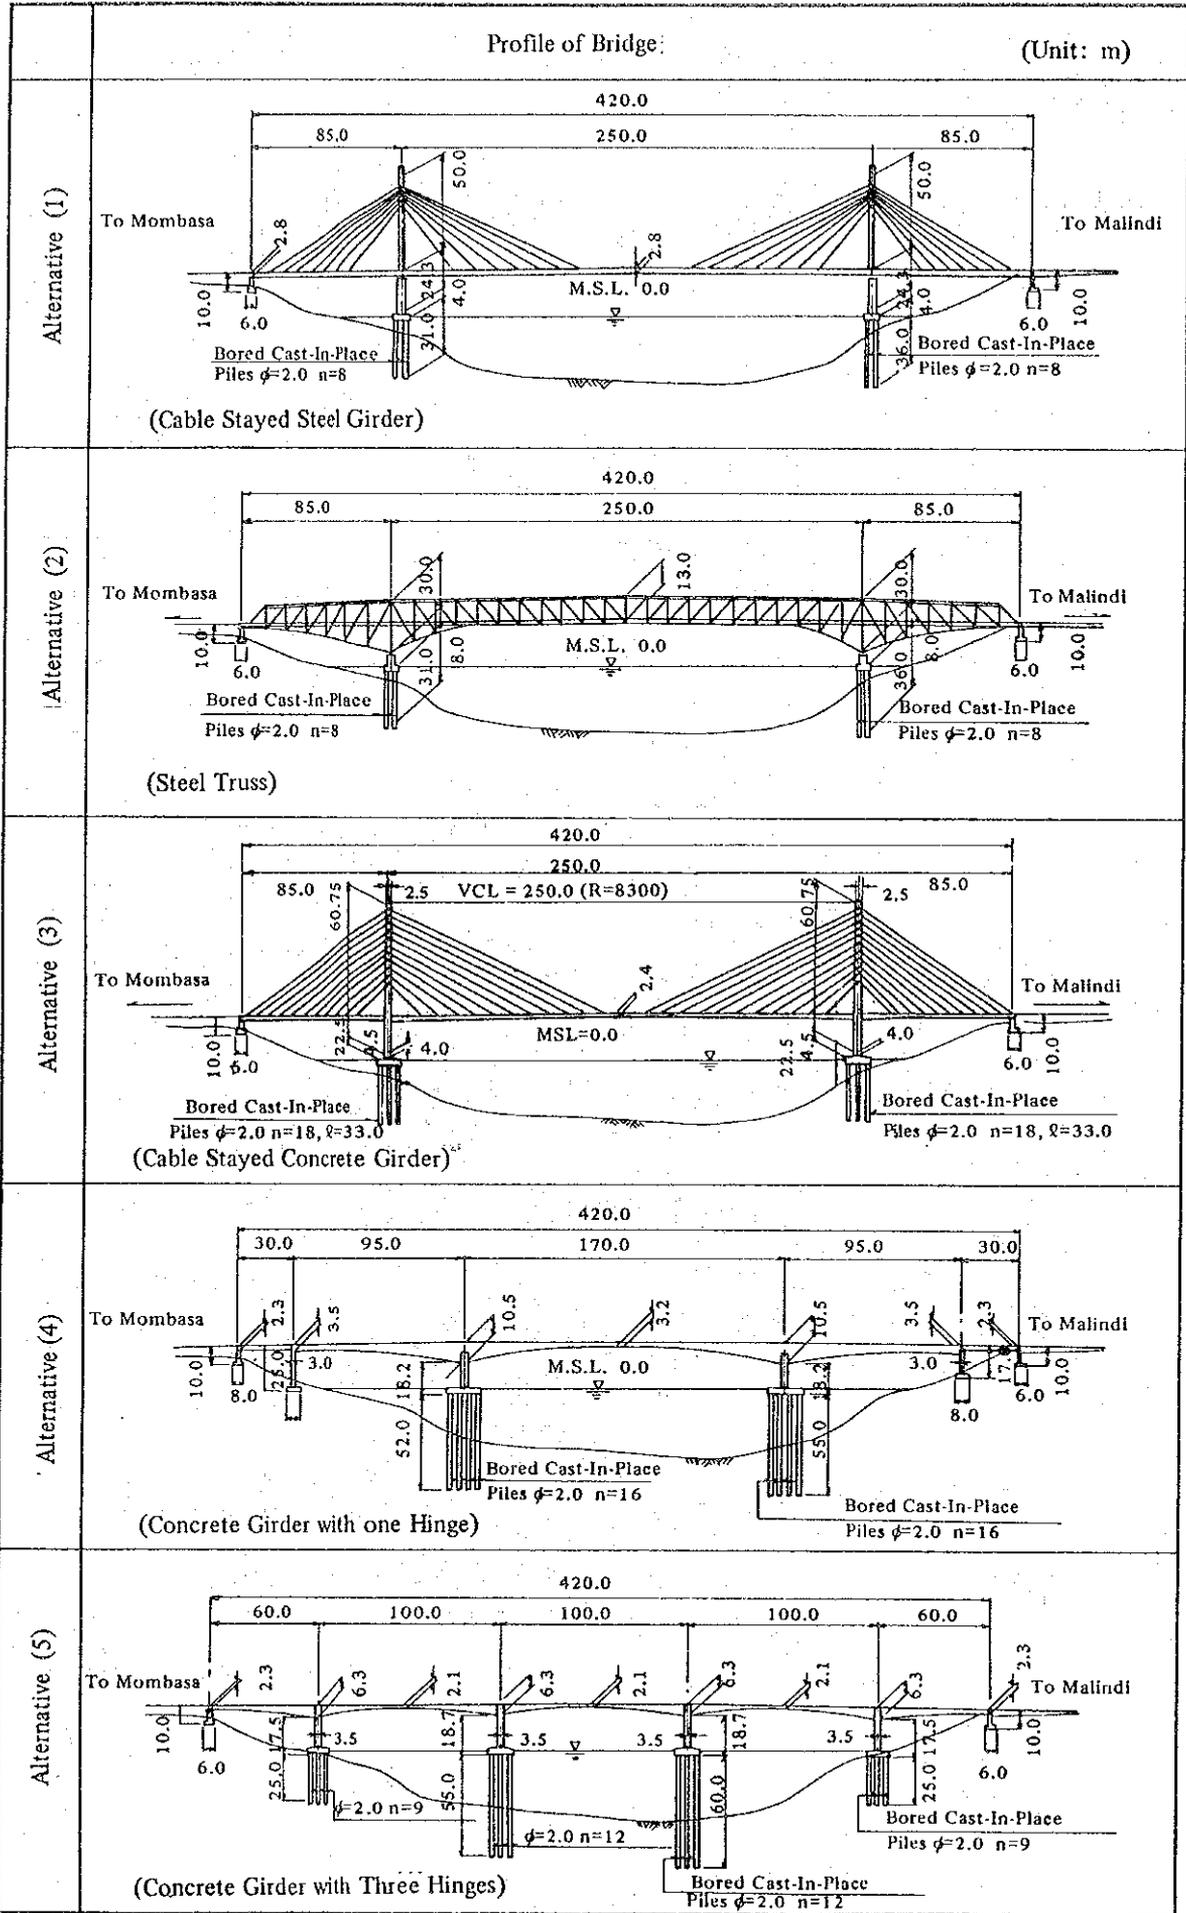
ALTERNATIVE BRIDGE PLAN
